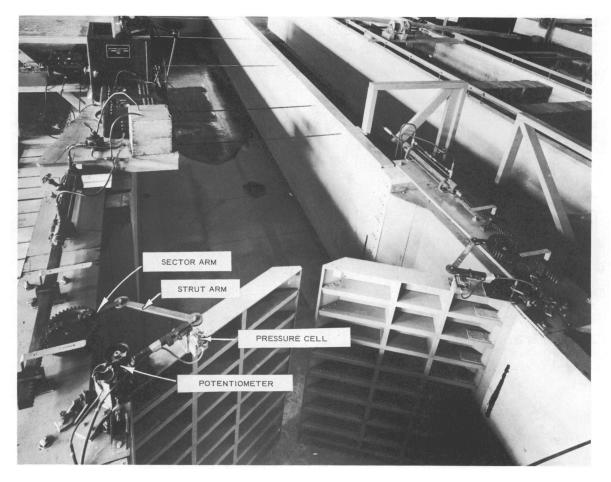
Details of downstream face of miter gate, linkage, and measuring equipment
